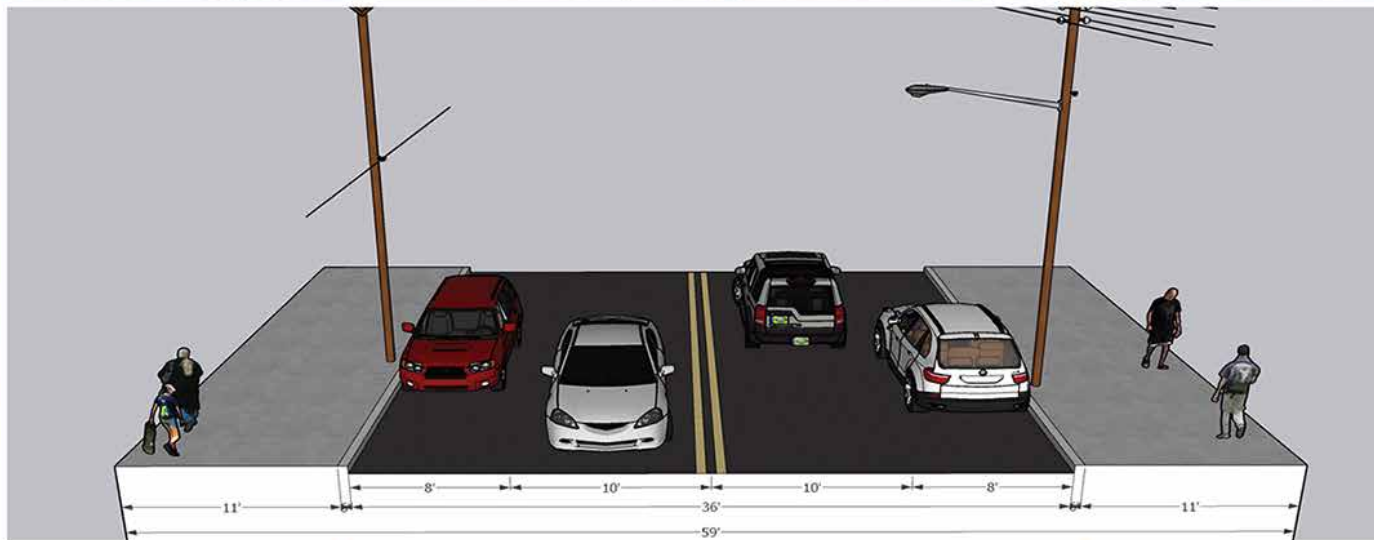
Albany Street : Craig St to Hamlin St Design Concept Cross-Section
